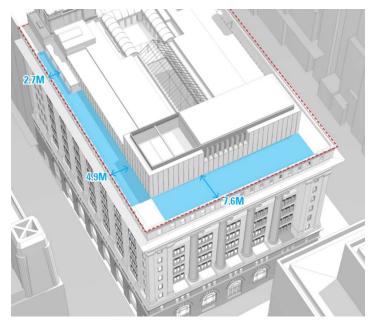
Approved roof form with setbacks between 2.7m to 7.6m
